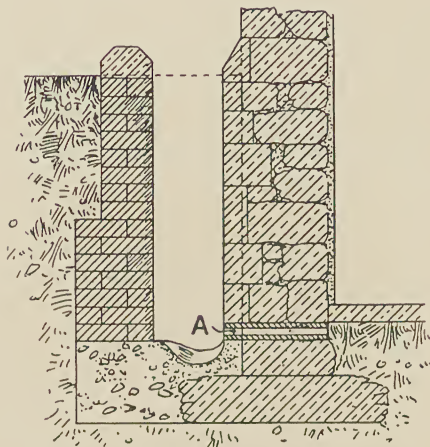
Old Stone Wall faced with New Stone, after forming open Area. A, new damp-course.
